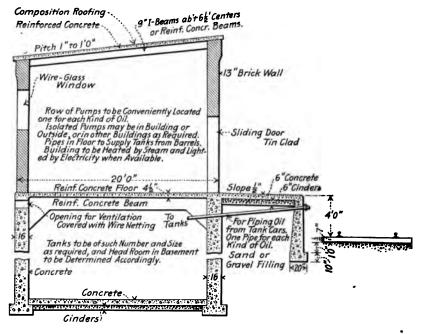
C.—Oil House, Roadway Buildings. (Am. Ry. Eng. Assn.)
